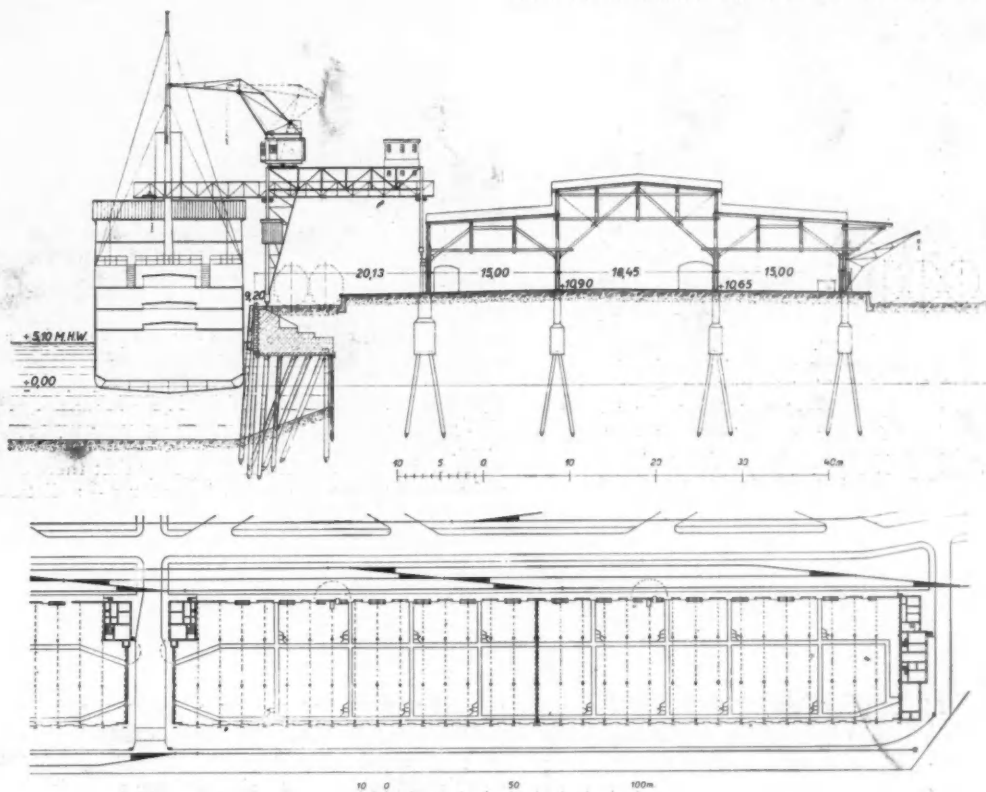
Cross Section and Ground Plan of a Modern Quay Shed.
